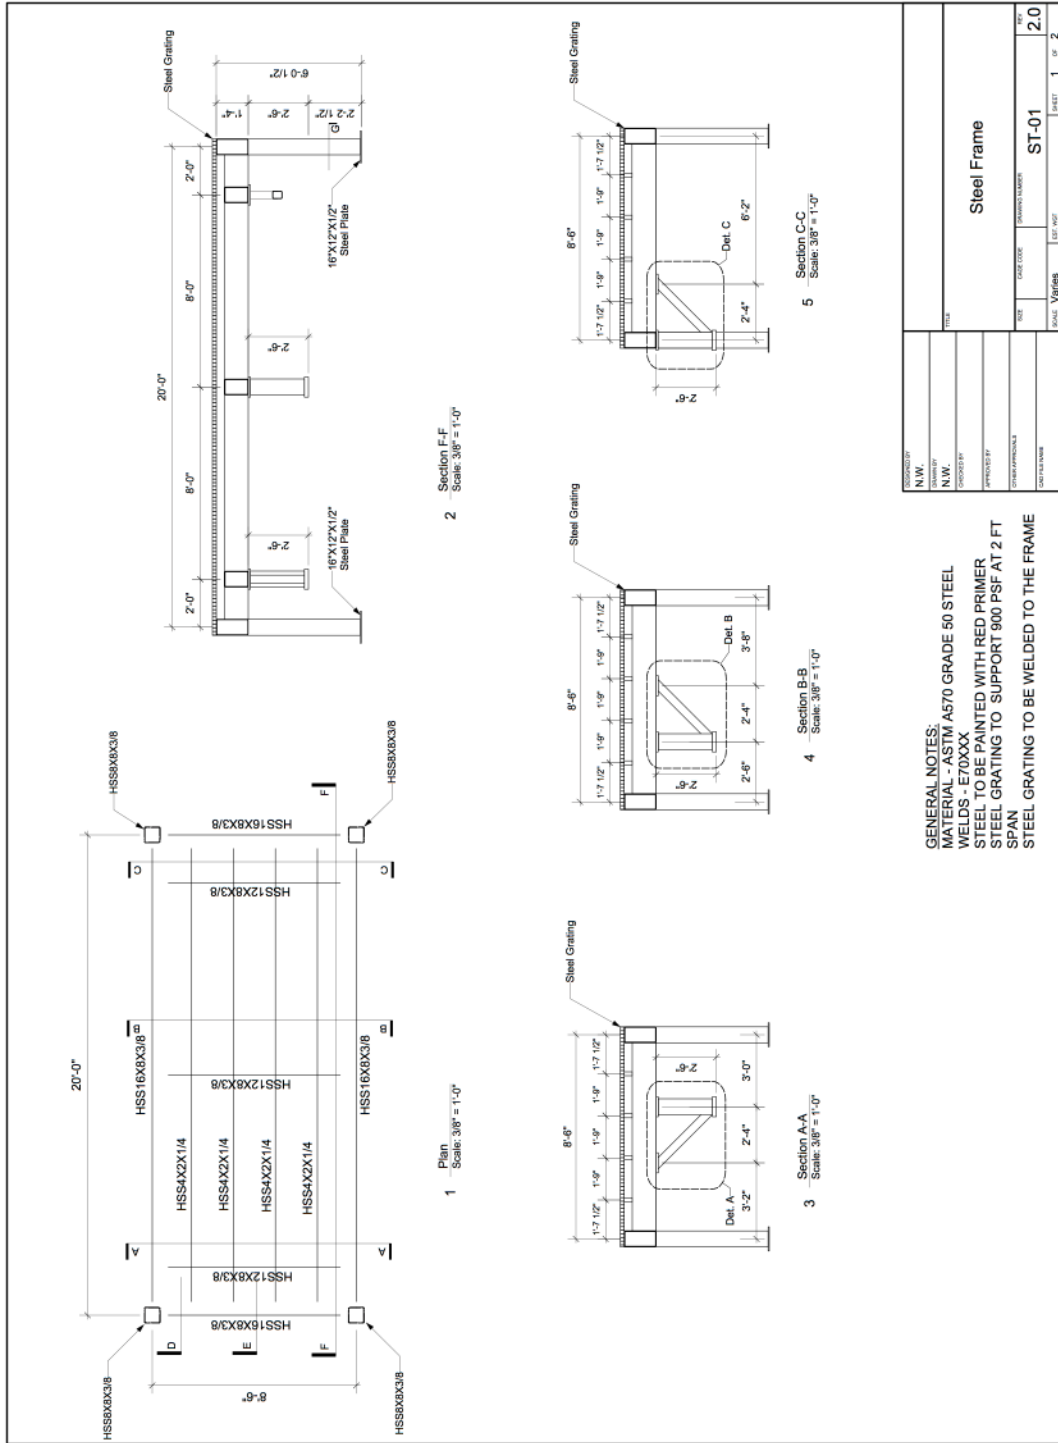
Test frame shop drawings “Base Frame Details and Sections”
